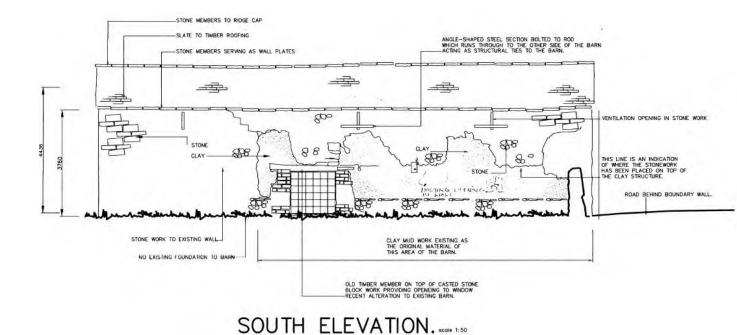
Southern Elevation survey drawing showing original rear elevation of the barn showing the extent of the clay daubin structure. Western end (right-hand side) sand stone construction.
